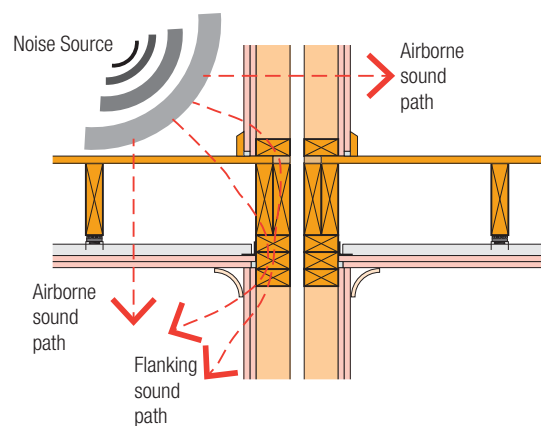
Flanking and Airborne Noise Pathways Through Floor/Wall Junction
